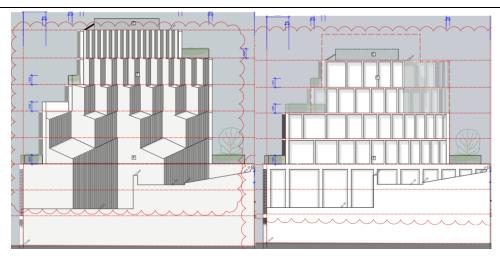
and 22: West Elevation of the Decision Plans (left), West Elevation of sketch plans (right)
